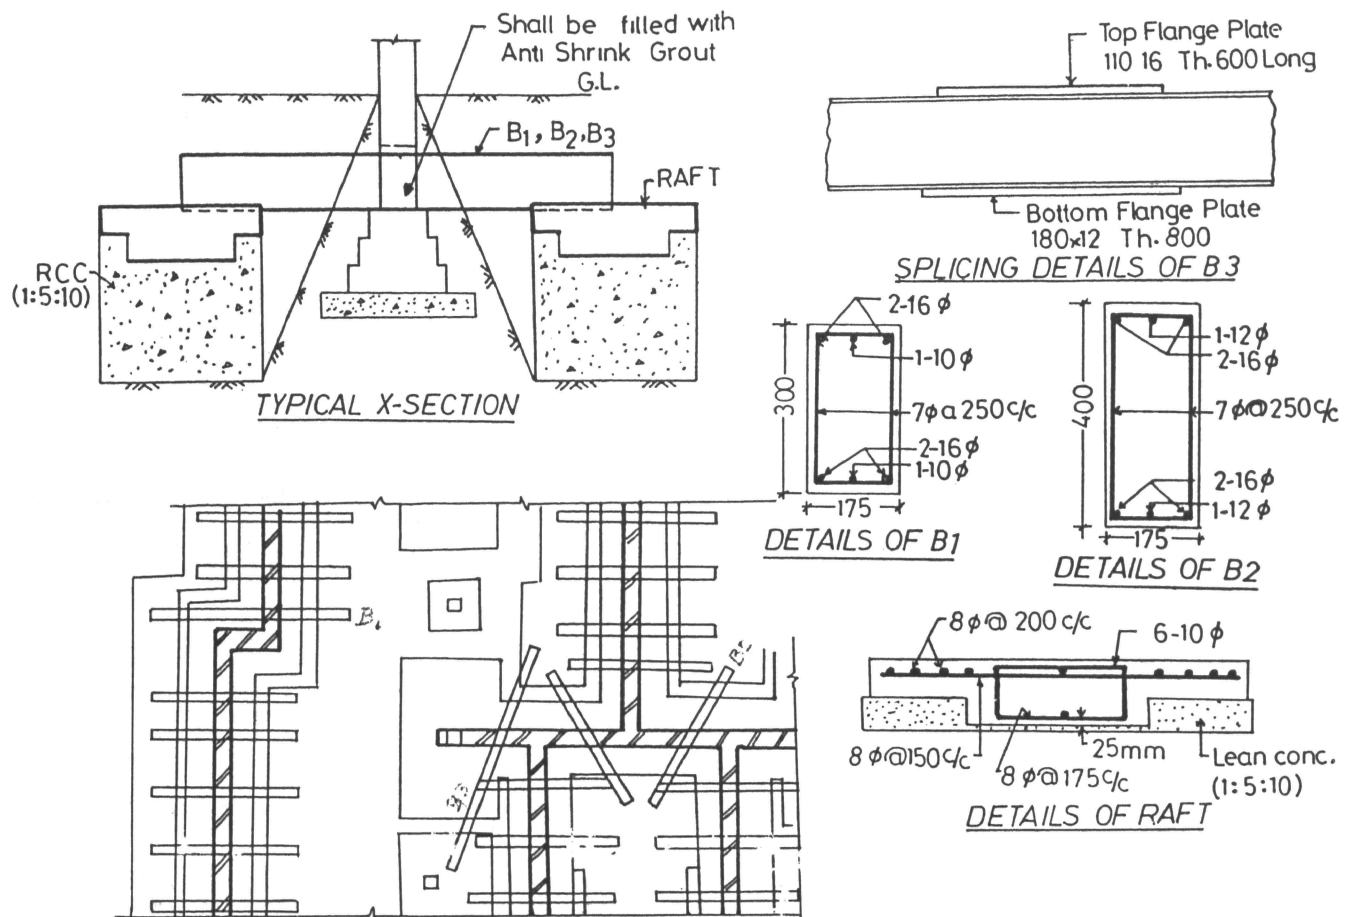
FOUNDATION PLAN with Rectification Proposal. CASE II
